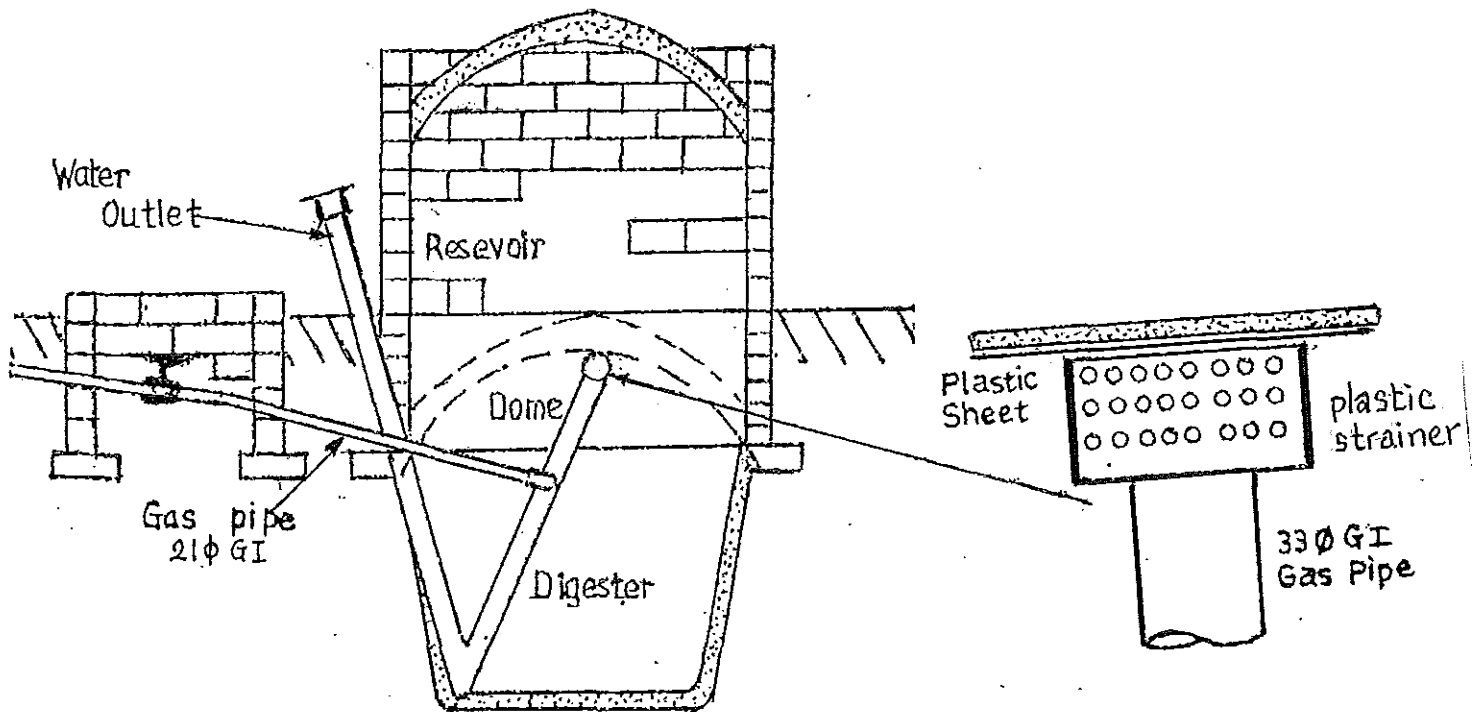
Alternative Gas Outlet for Tunnel Plant
